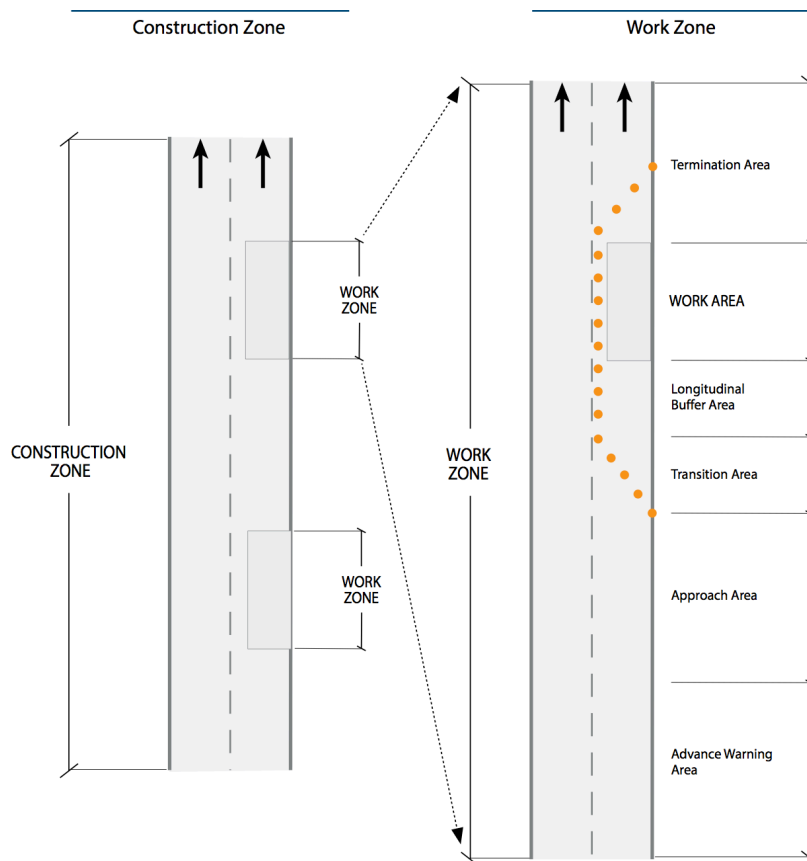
Design of a typical construction zone (Figure 1 from [OTM7])
